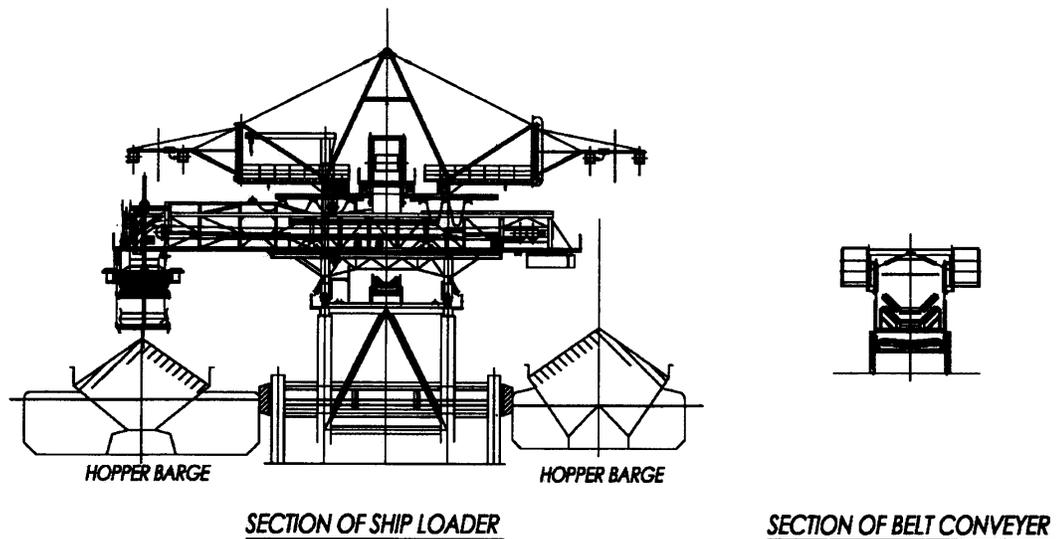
Section of Ship Loader and Belt Conveyer
